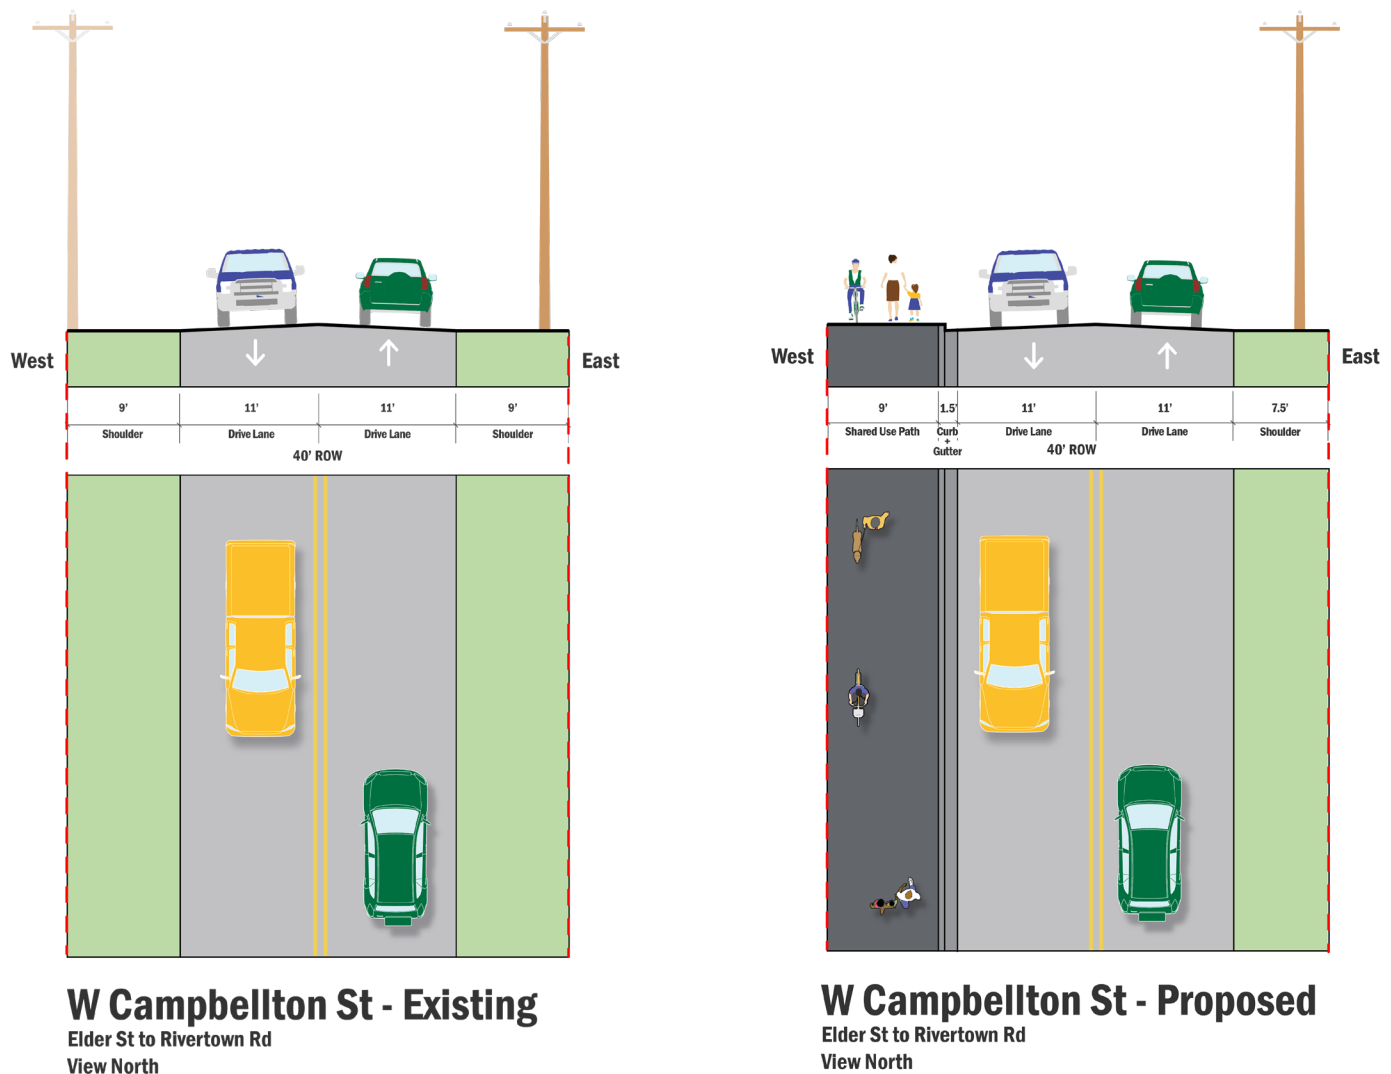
West Campbellton Street (Elder Street to Rivertown Road) Typical Sections
